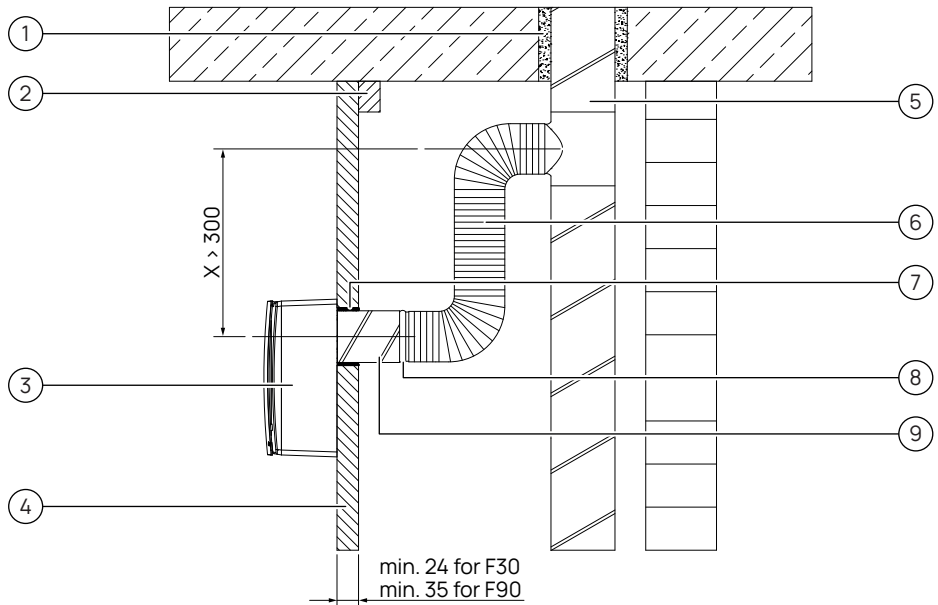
Cutaway drawing – fire protection wall structure with surface-mounted housing
